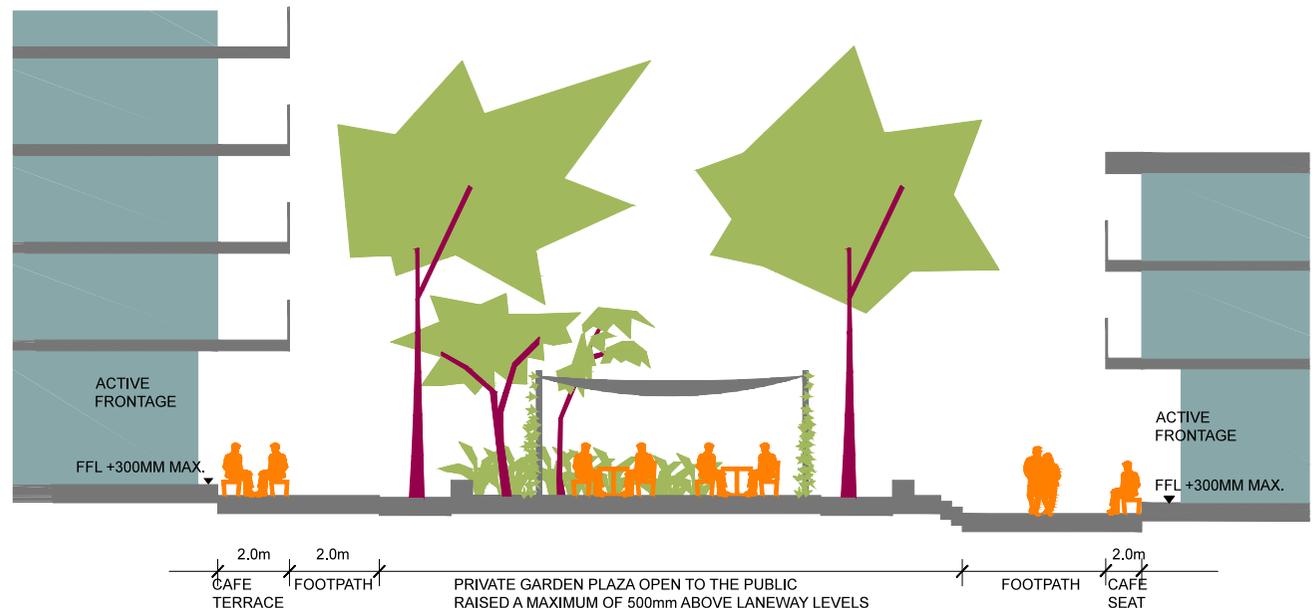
| Indicative cross section through Laneway B showing courtyard space
